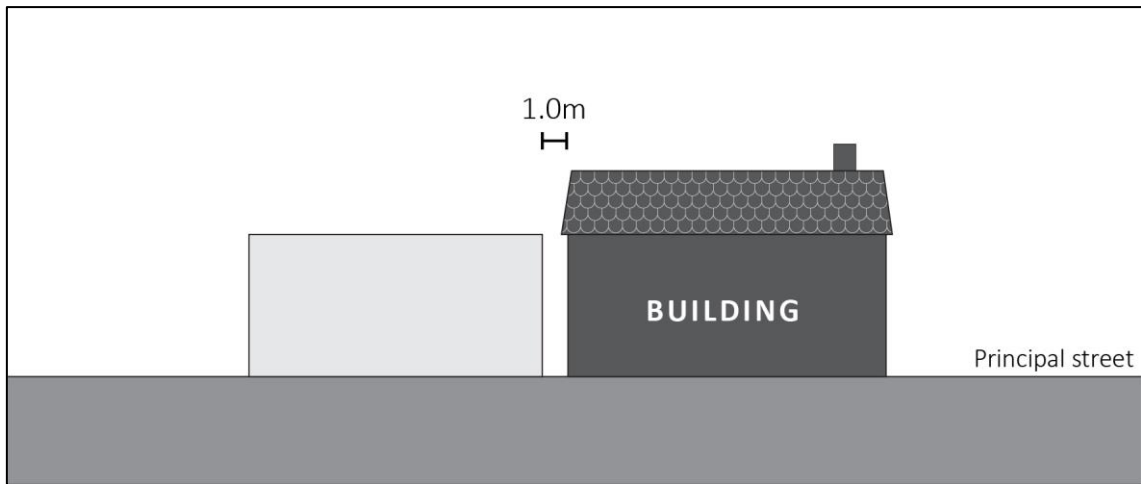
Construction or extension of an outbuilding is exempt if the height of the outbuilding (from natural ground level) does not exceed three metres
